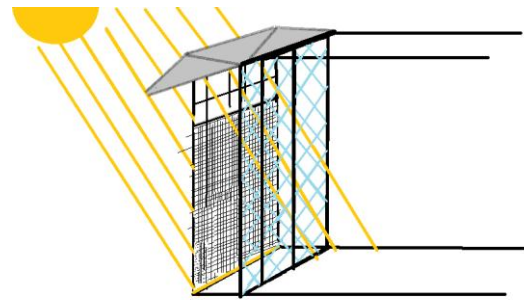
Solar action post-installation of chicks. Minimum light enters through the window aperture, shielding the house from high summer sun.
